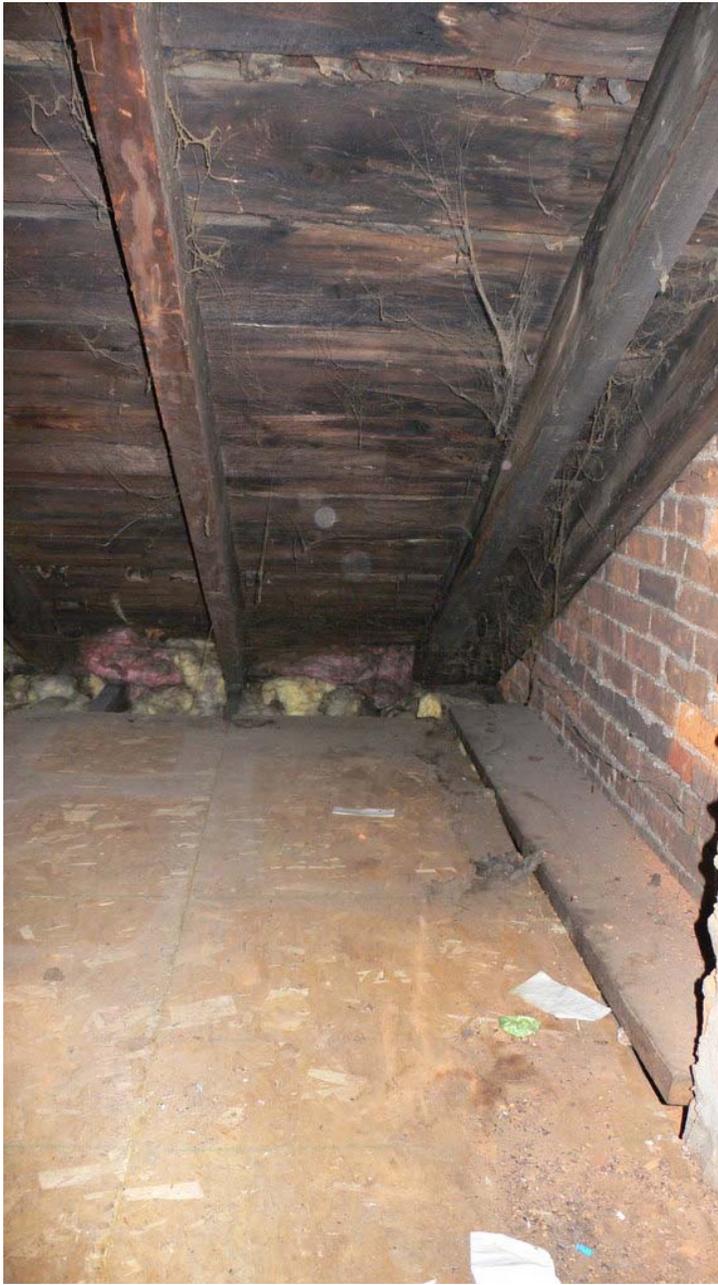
507 West 12th St, garret at front of house looking north, east (hearth) wall at right.
